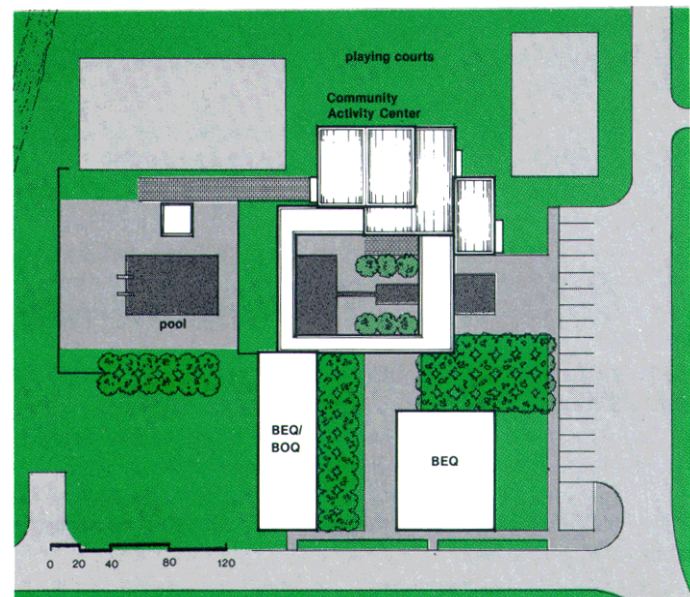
42 Fort Remote: Community Activity Center-Site Plan
